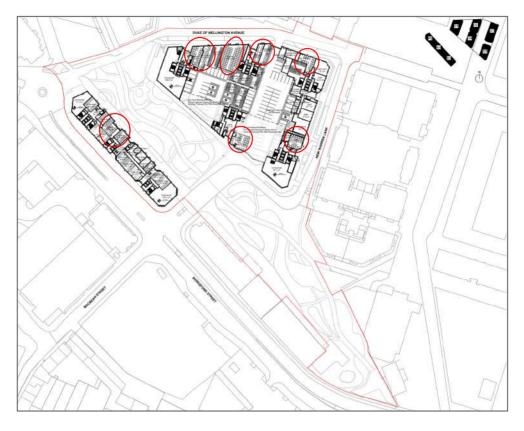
Refuse Store Locations on Proposed Site Wide Ground Floor Plan (PRP, February 2024)
